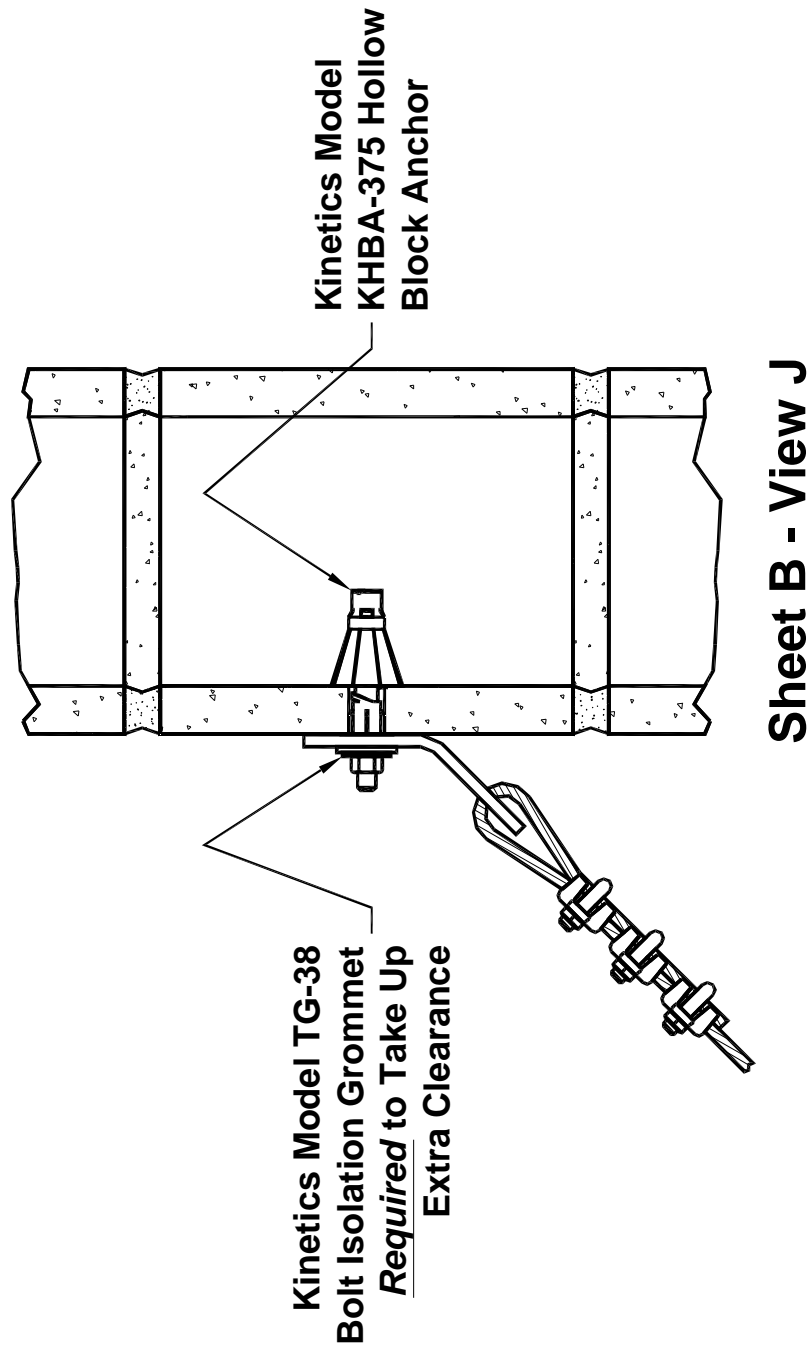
; KSCC “Umbrella” Type Adhesive Anchor Attachment to a Hollow CMU Wall
